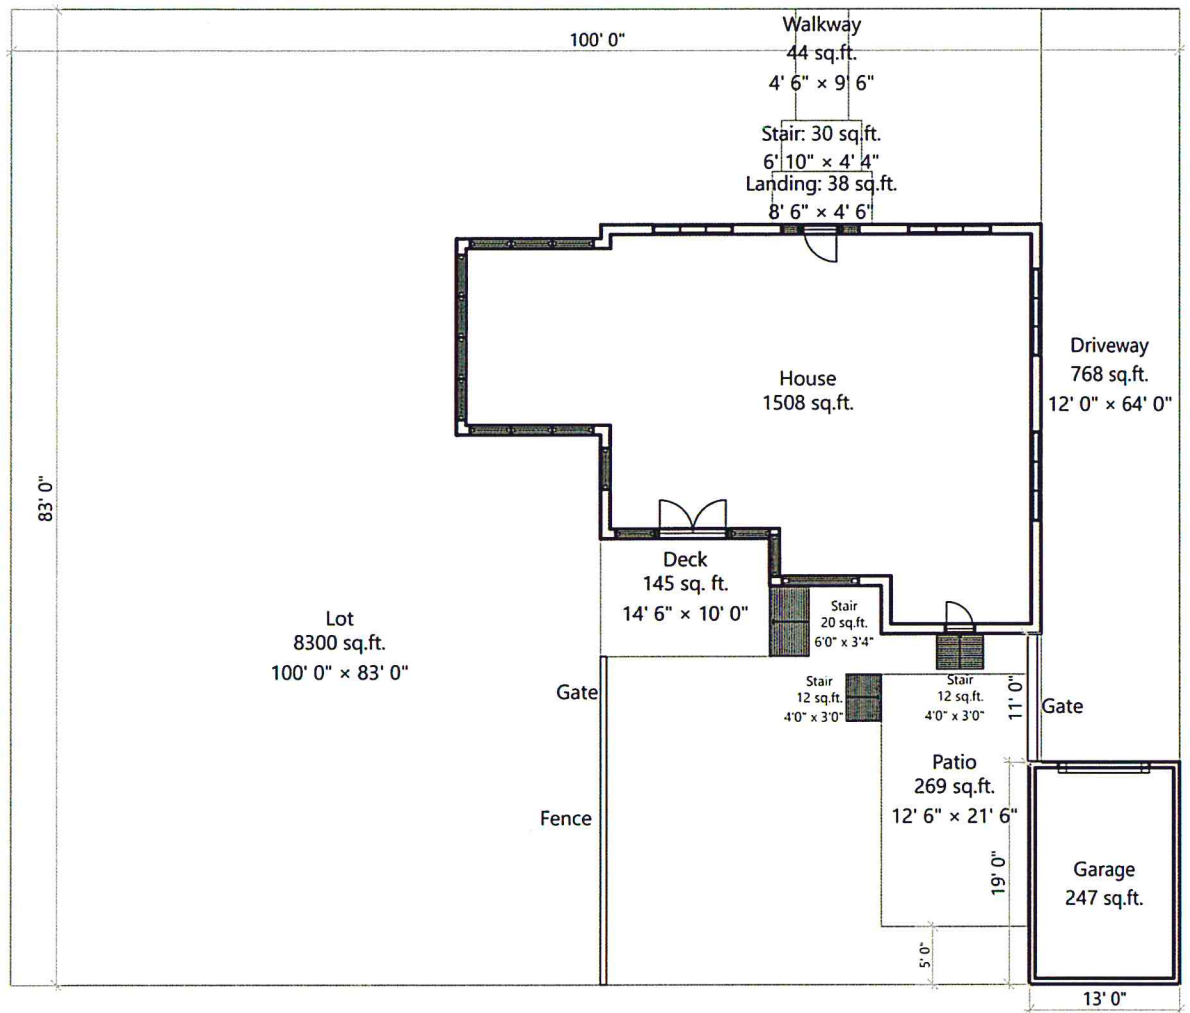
Proposed site plan adds brick or stone patio and wood patio stair, adds an enclosed fence, replaces gravel with concrete driveway, and replaces garage door.
